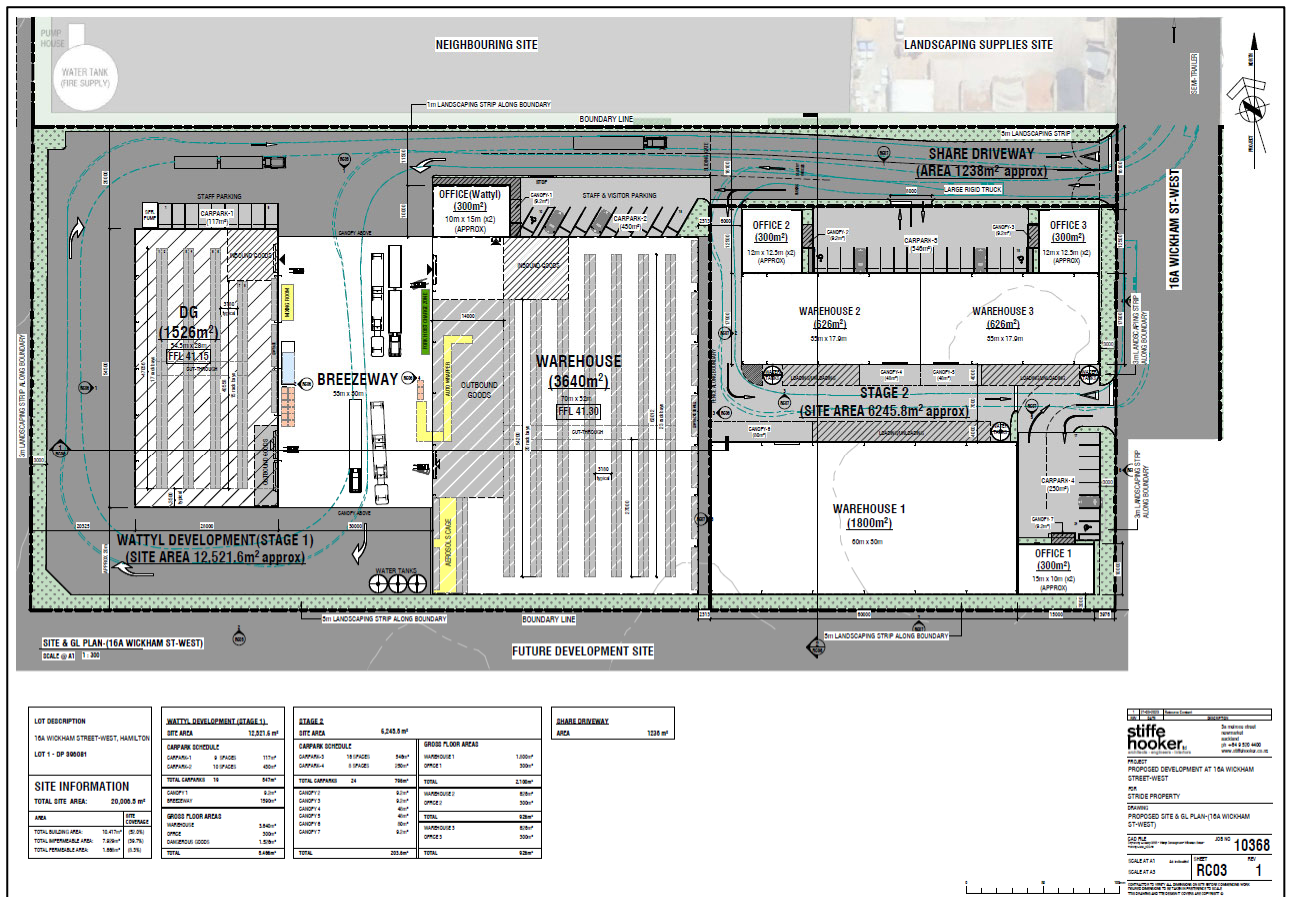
Proposed Site Plan (including both Stages 1 and 2)
